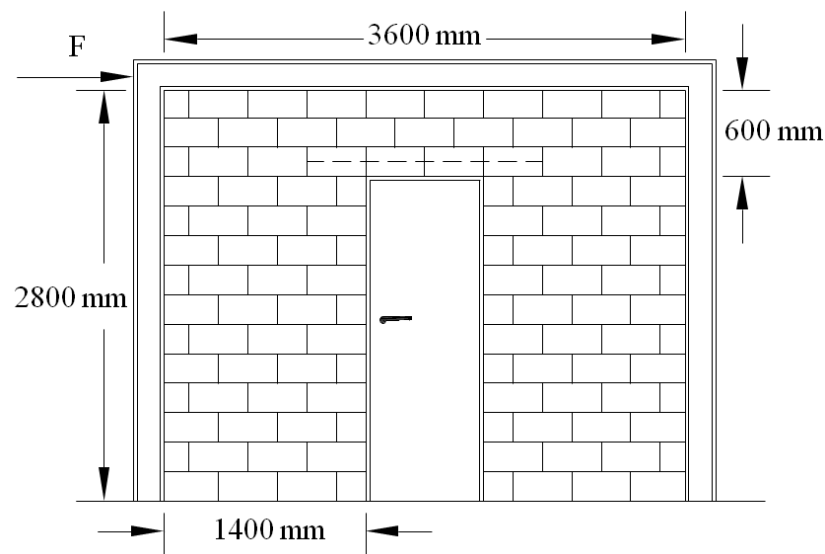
9. WC4 Experimental Test (Perforated Infill Wall With Horizontal Reinforcements Only) [Dawe et al. 1989] (NTS)
